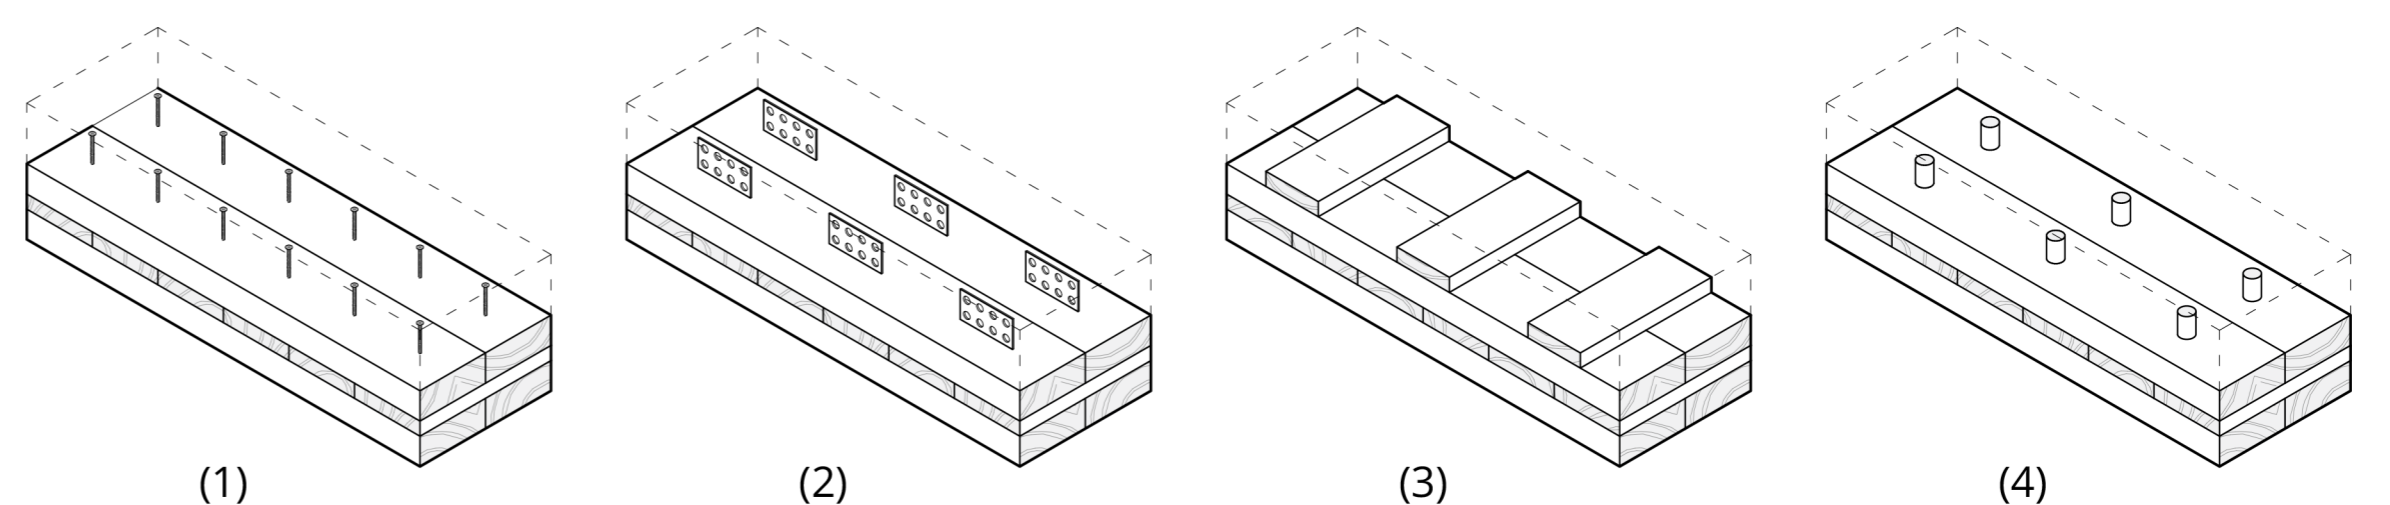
Most commonly used connections: (1) screws; (2) steel plates glued to timber; (3) transversal glued boards; (4) timber dowels © E. MARY
